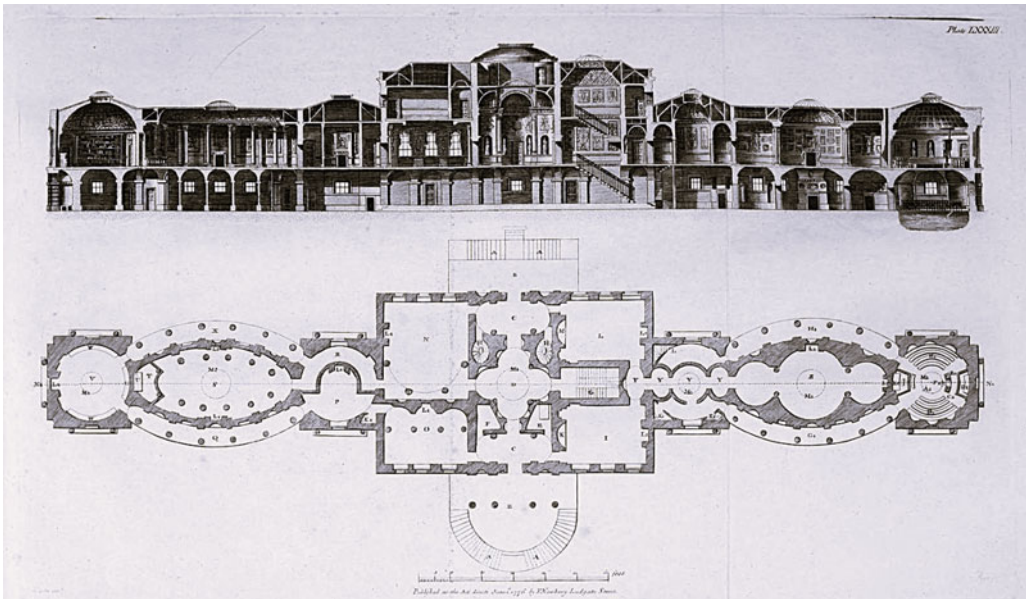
John Carter, plan of the first floor of Bywell Hall, from *Builder's Magazine* 1776, pl LXXXIII.
